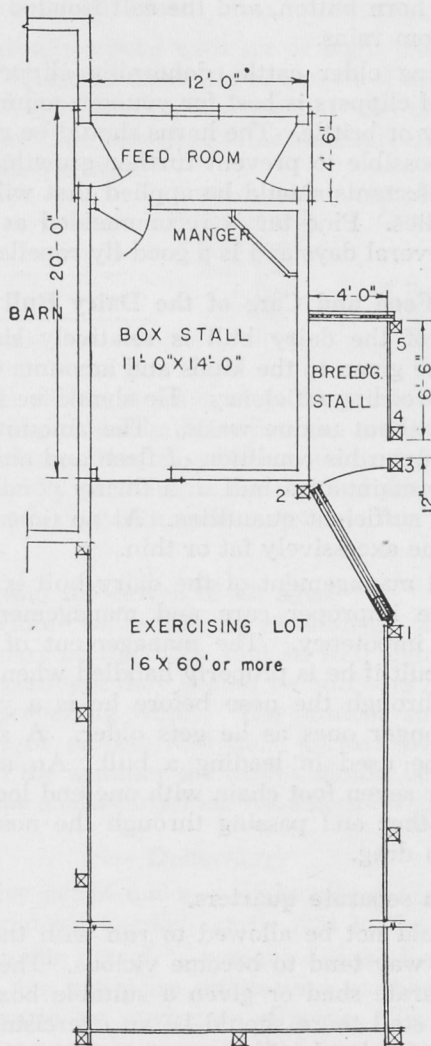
Floor plan of a bull shed, exercising yard, and breeding stall.
